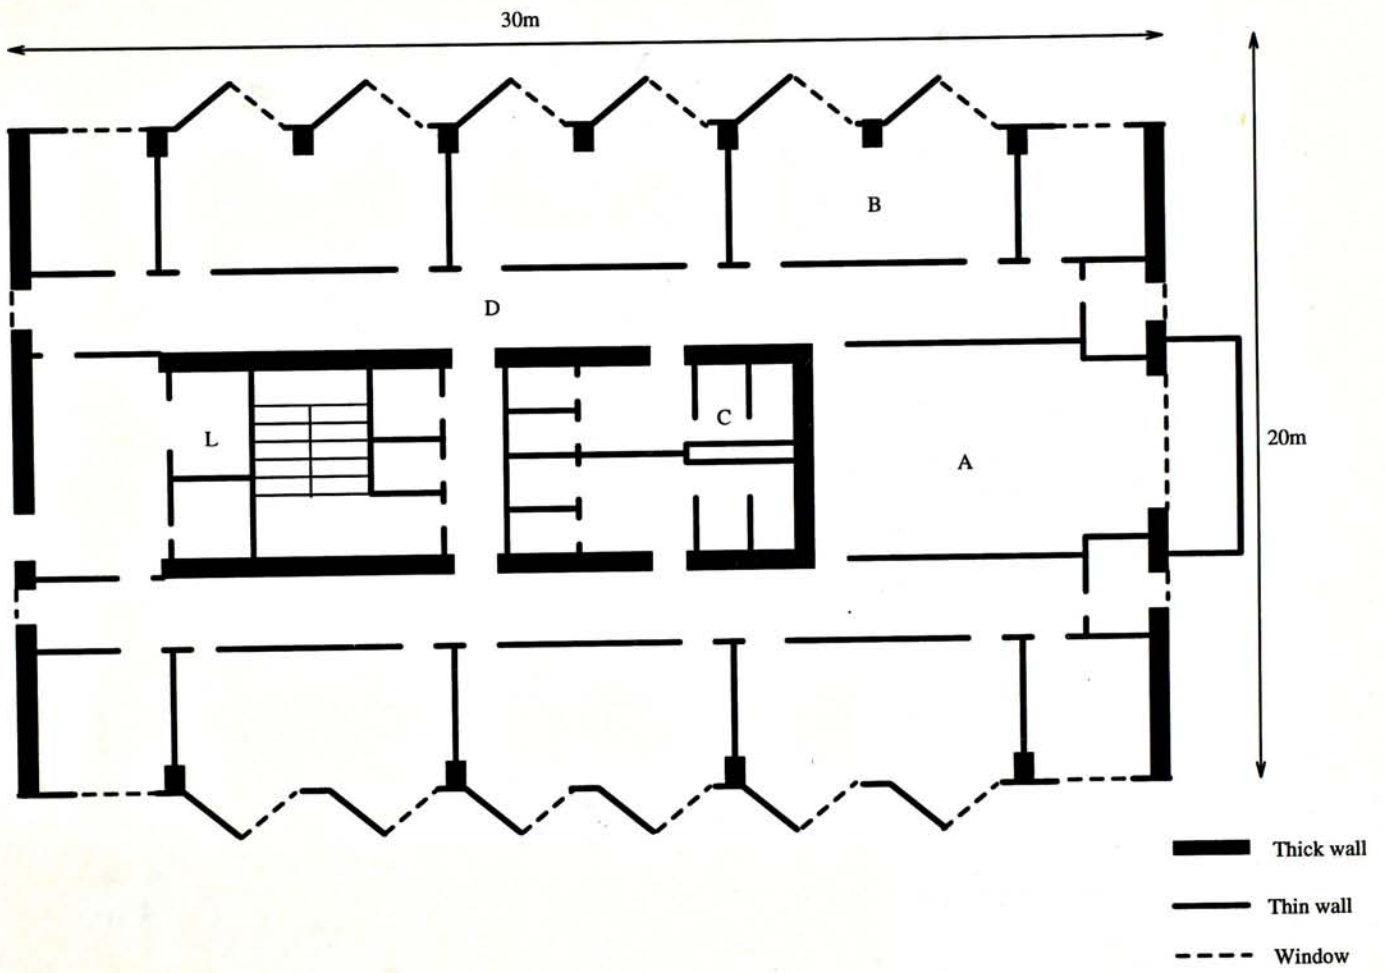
Floor plan of third floor, Postgraduate Hostel
